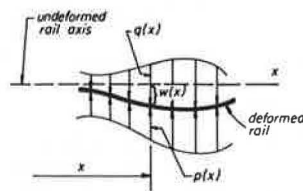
Continuously supported rail subjected to a load $q(x)$.
